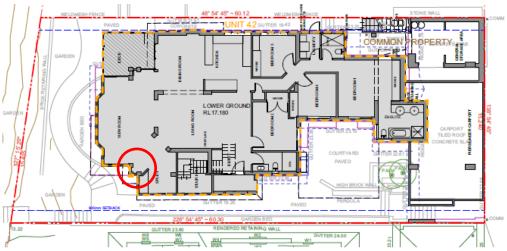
Existing Lower Ground Floor Plan. (Source: Quattro Architects)
